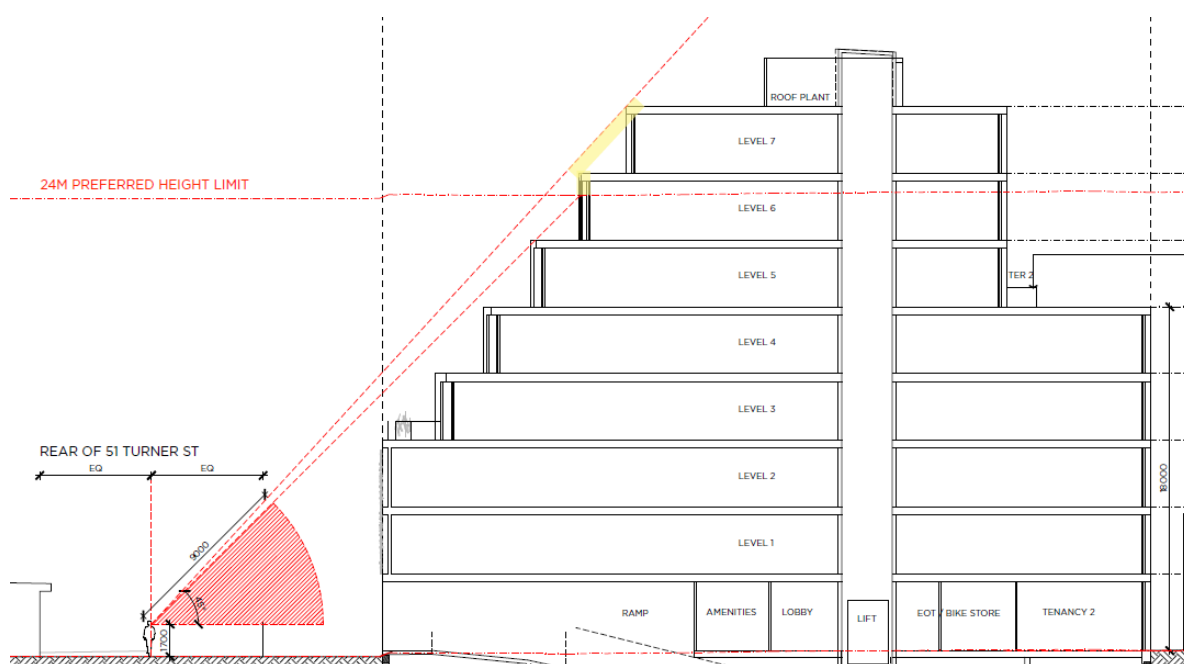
Sightline diagram comparing proposed visual bulk impacts to that of a building with the preferred building height (24m) (applicant submission, February 2021).
